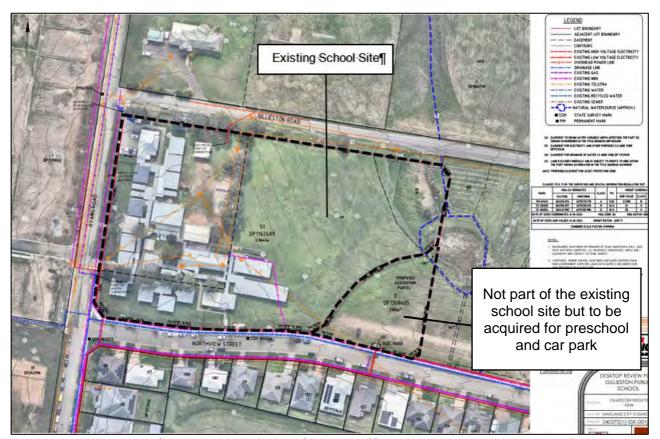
Survey and Existing Site Plan (Source: ADW Johnson, 2024)
